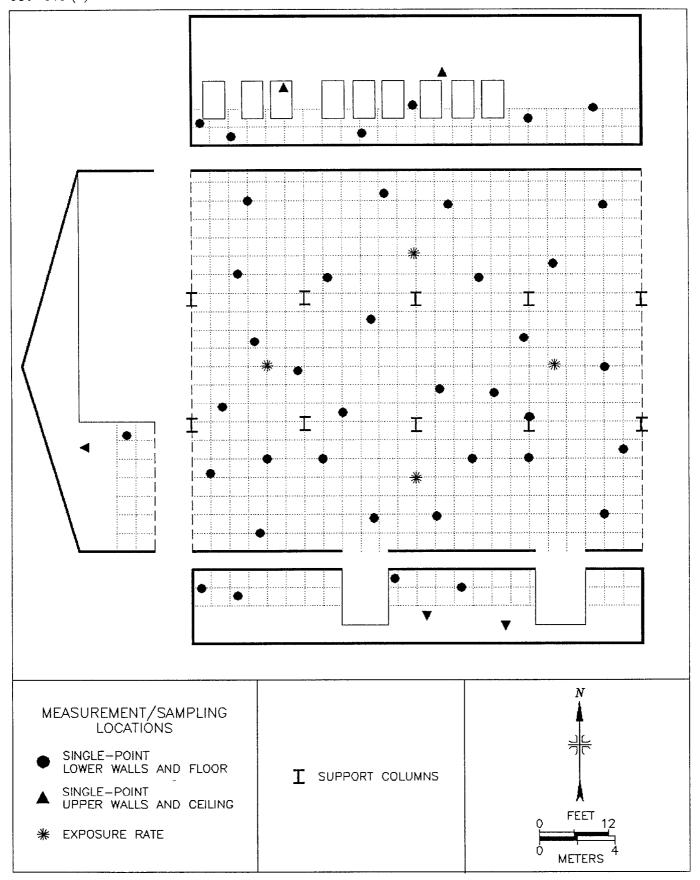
North Building, Area 8E — Measurement and Sampling Locations
